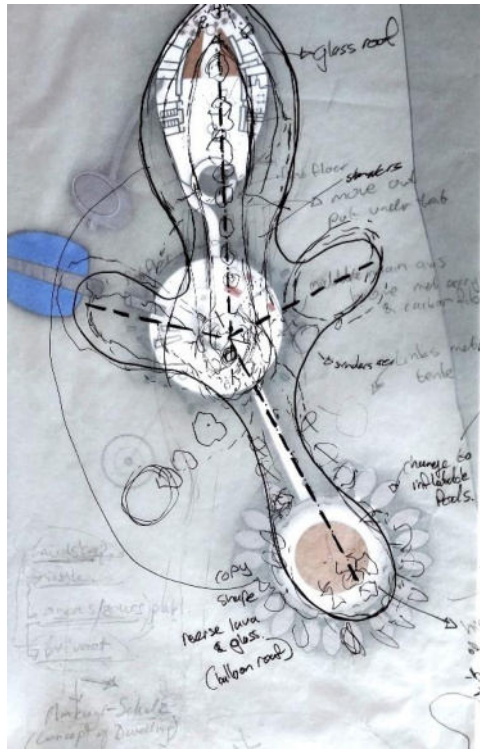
Progress drawing showing the development of the floor plan shape from previous floor plan (author, 20 July)
